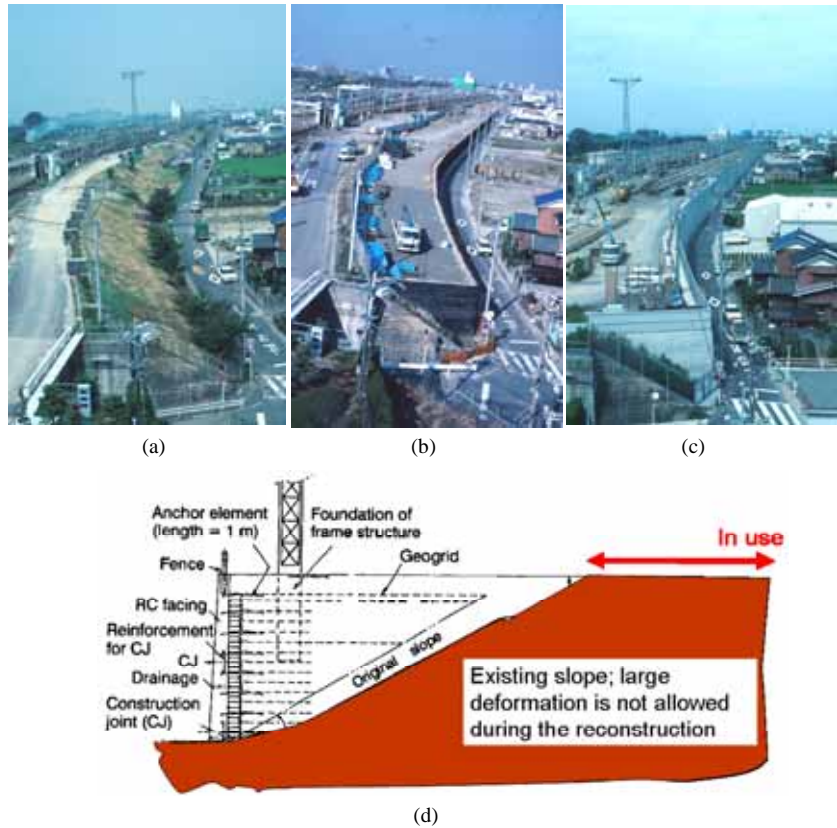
(a) Before; (b) during; and (c) after reconstruction of embankment slope to a GRS RW having a FHR facing; and (d) typical cross-section, a yard for bullet trains (Shinkansen) in Nagoya; average wall height = 5 m; total length = 930 m; and construction period = 1990 ~ 1991 (Tatsuoka *et al.*, 1997)
